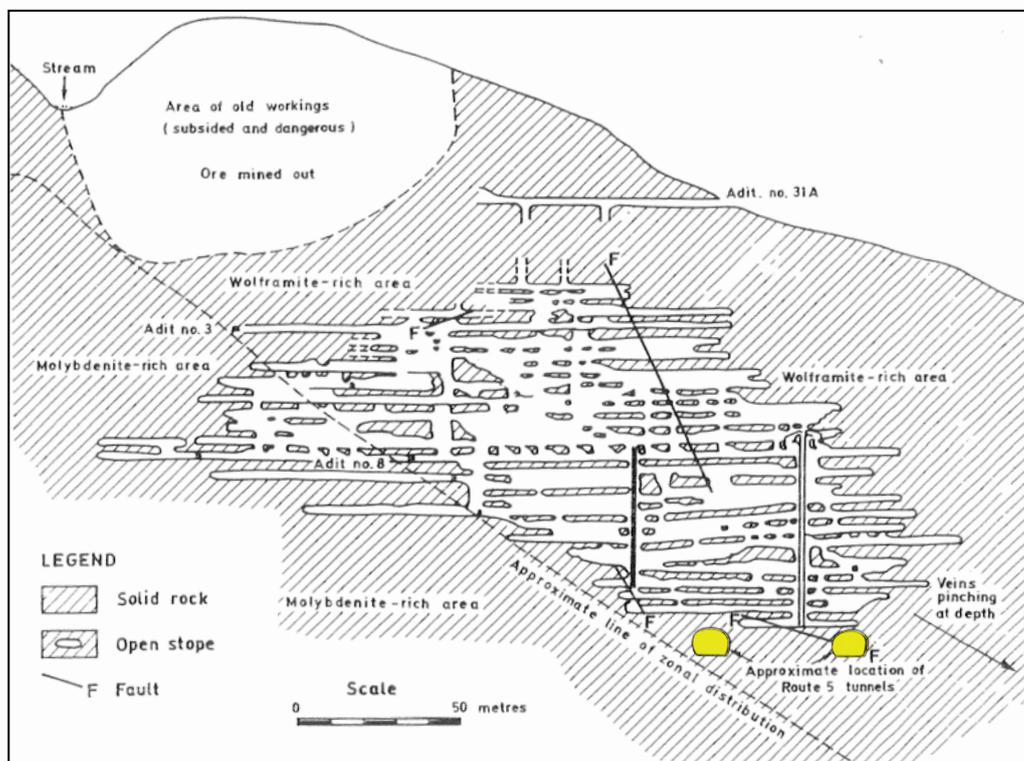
Cross-section showing extent of underground mining and old subsided near-surface workings of the Needle Hill wolframite mine (after Roberts & Strange, 1991)
